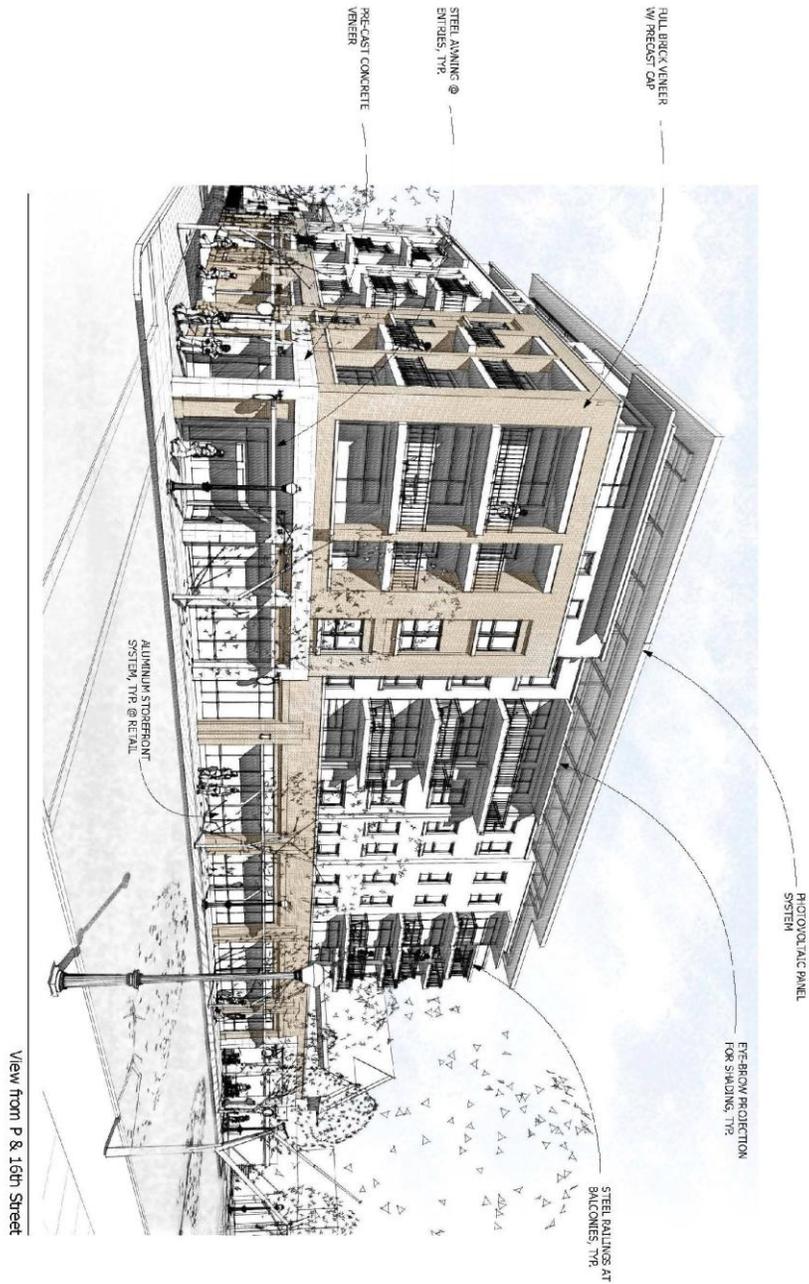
Exhibit D: Corner Entry at 16<sup>th</sup> and P Street
